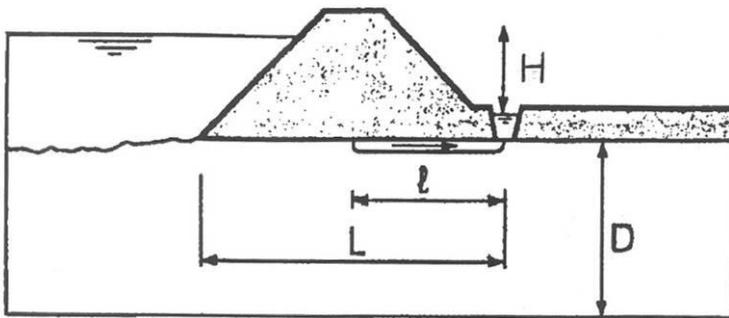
Backward erosion piping at back (upstream) end of a thin pipe below a “roof” (Koenders and Sellmeijer 1992)
